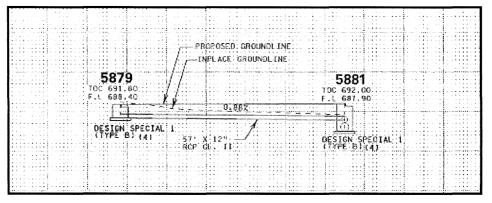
PRE-CONSTRUCTION PROFILE OF STORM SEWER 5879 TO 5881
